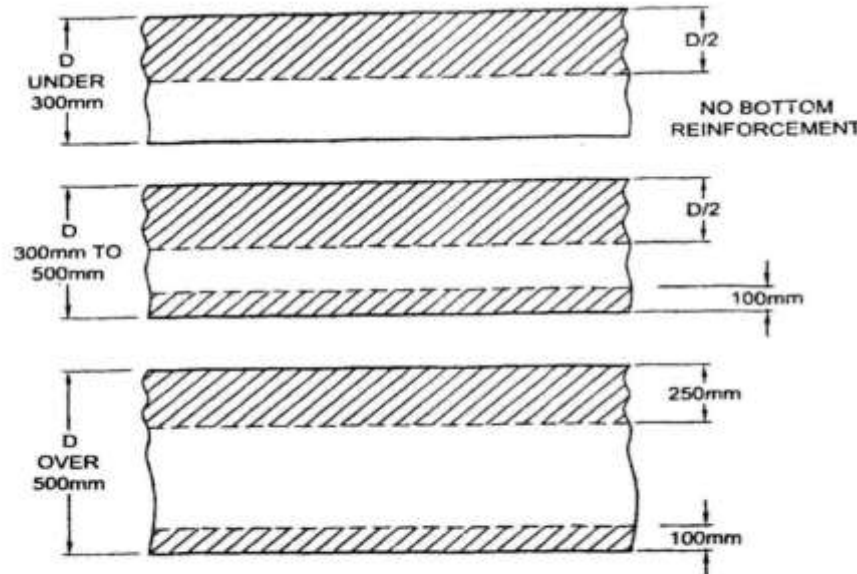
SURFACE ZONES: GROUNDED SLABS
